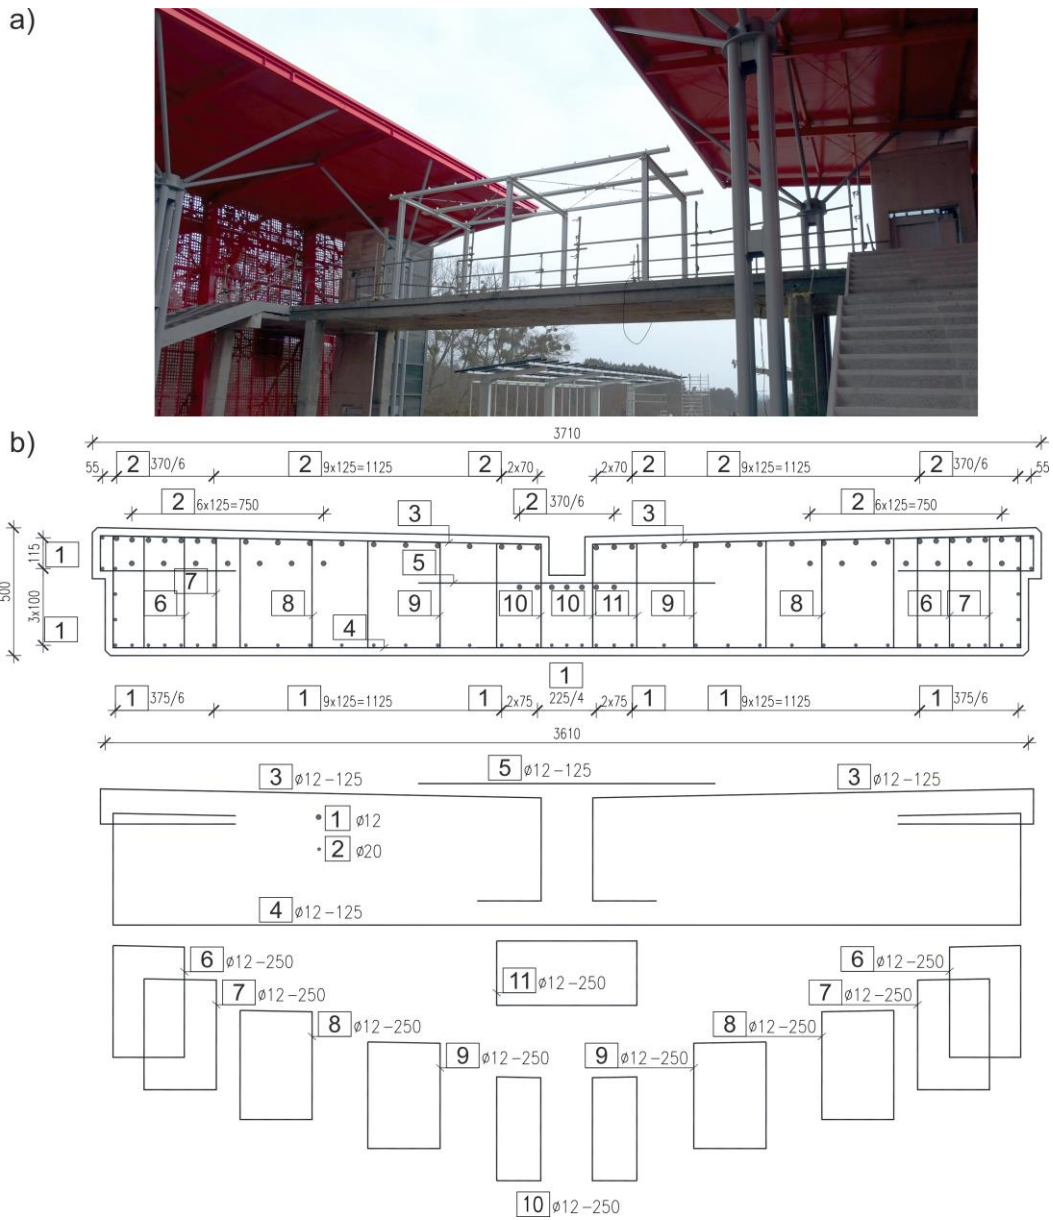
Reinforced concrete footbridge (Gdańsk, Poland, 54°21'19.0"N 18°31'44.2"E):
